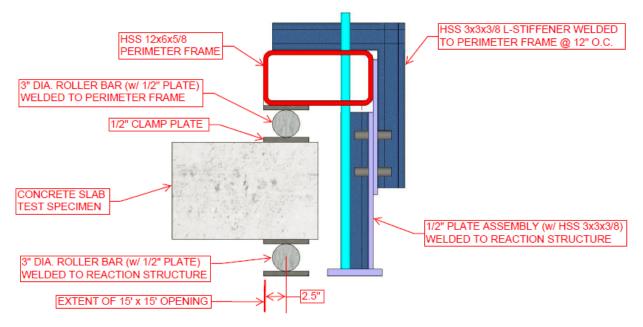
Steel Framing Set-Up 2 Layout (Section View)
